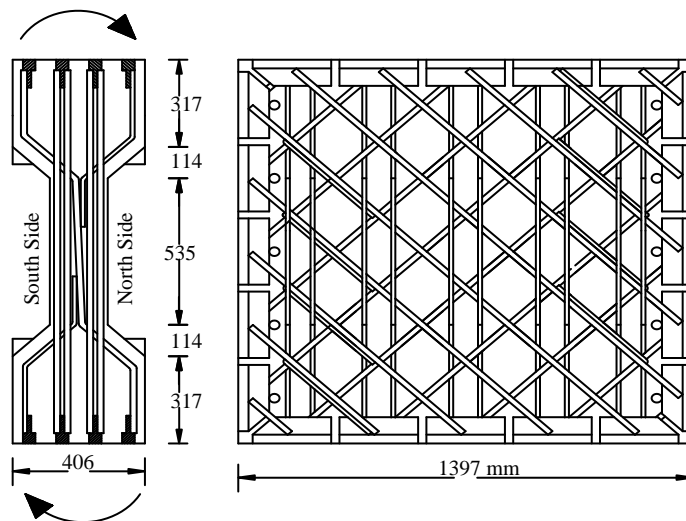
Reinforcement layout of panel OP5 and OP6 (25.4 mm = 1")
